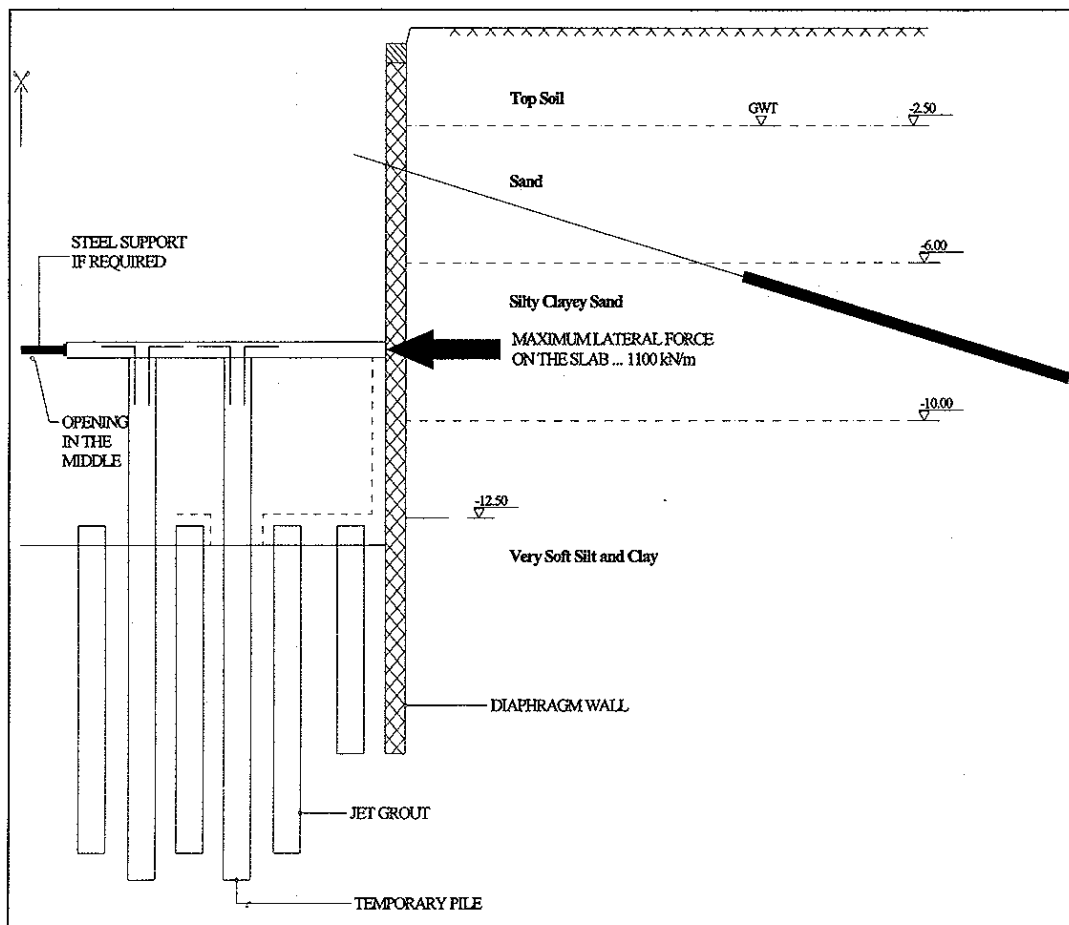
Section showing the retaining wall with r.c. floor slab and temporary bored piles.
